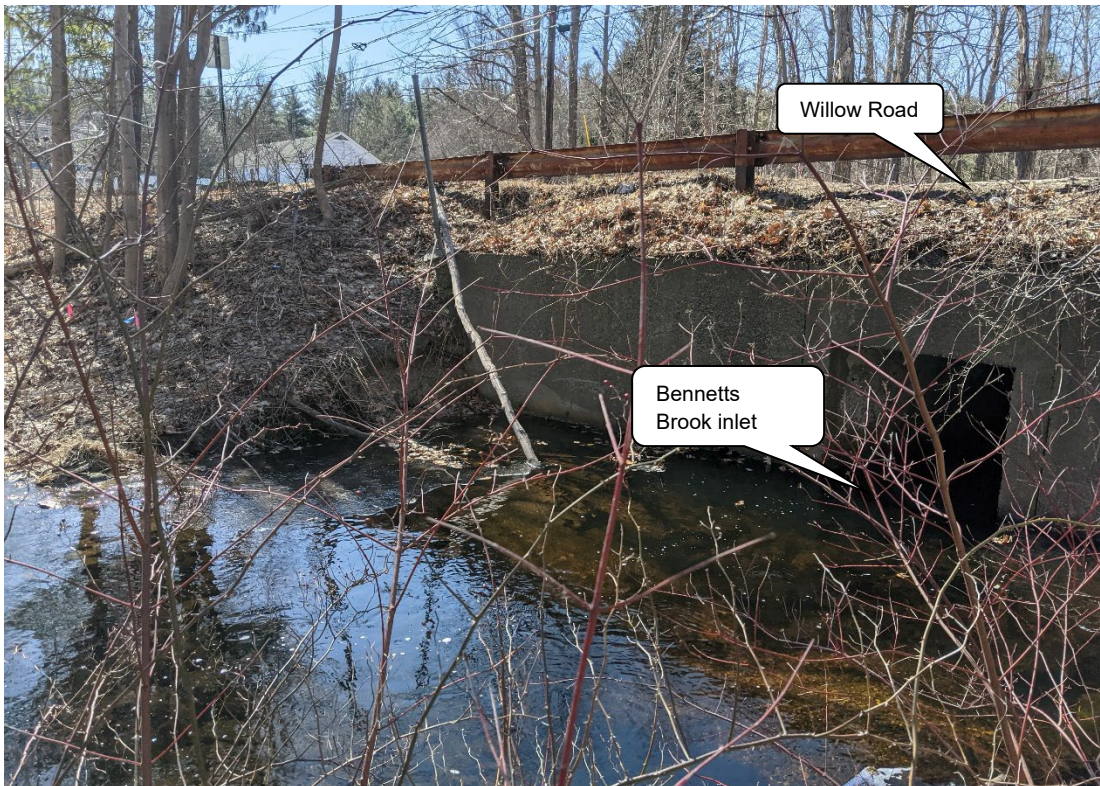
Approx. Sta. 18+00, View northwest down Willow Road towards Bennetts Brook crossing
